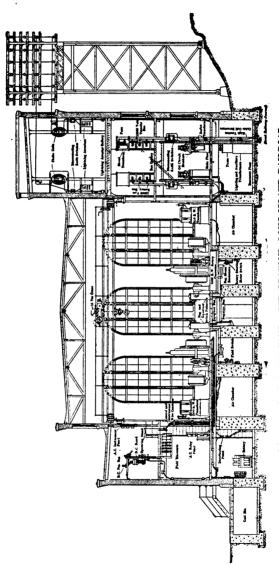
SIDE ELEVATION — SUB-STATION, LONG ISLAND RAILROAD.
